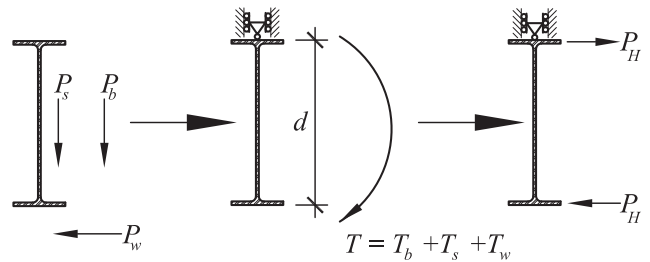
Equivalent lateral forces on spandrel beam flange.
